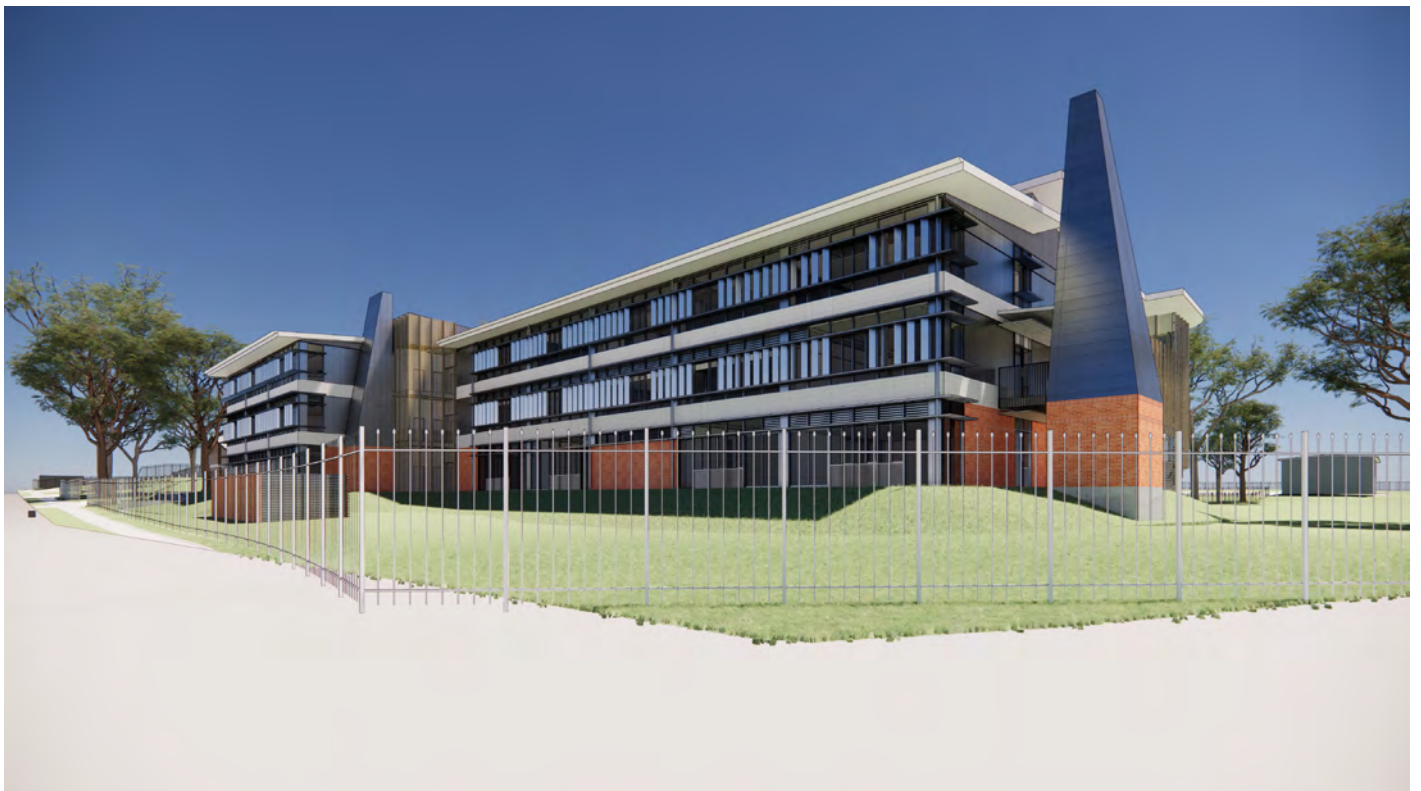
View looking southwest towards the new building from Glenwood Park Drive (landscaping and OSD removed for clarity)
